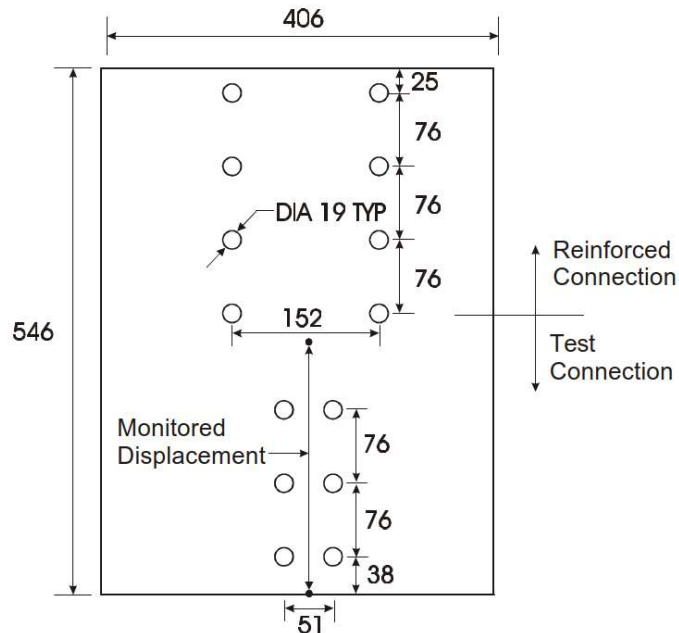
Test specimen T1 (Huns B. B. S., Grondin G., Driver R. G., 2002)
